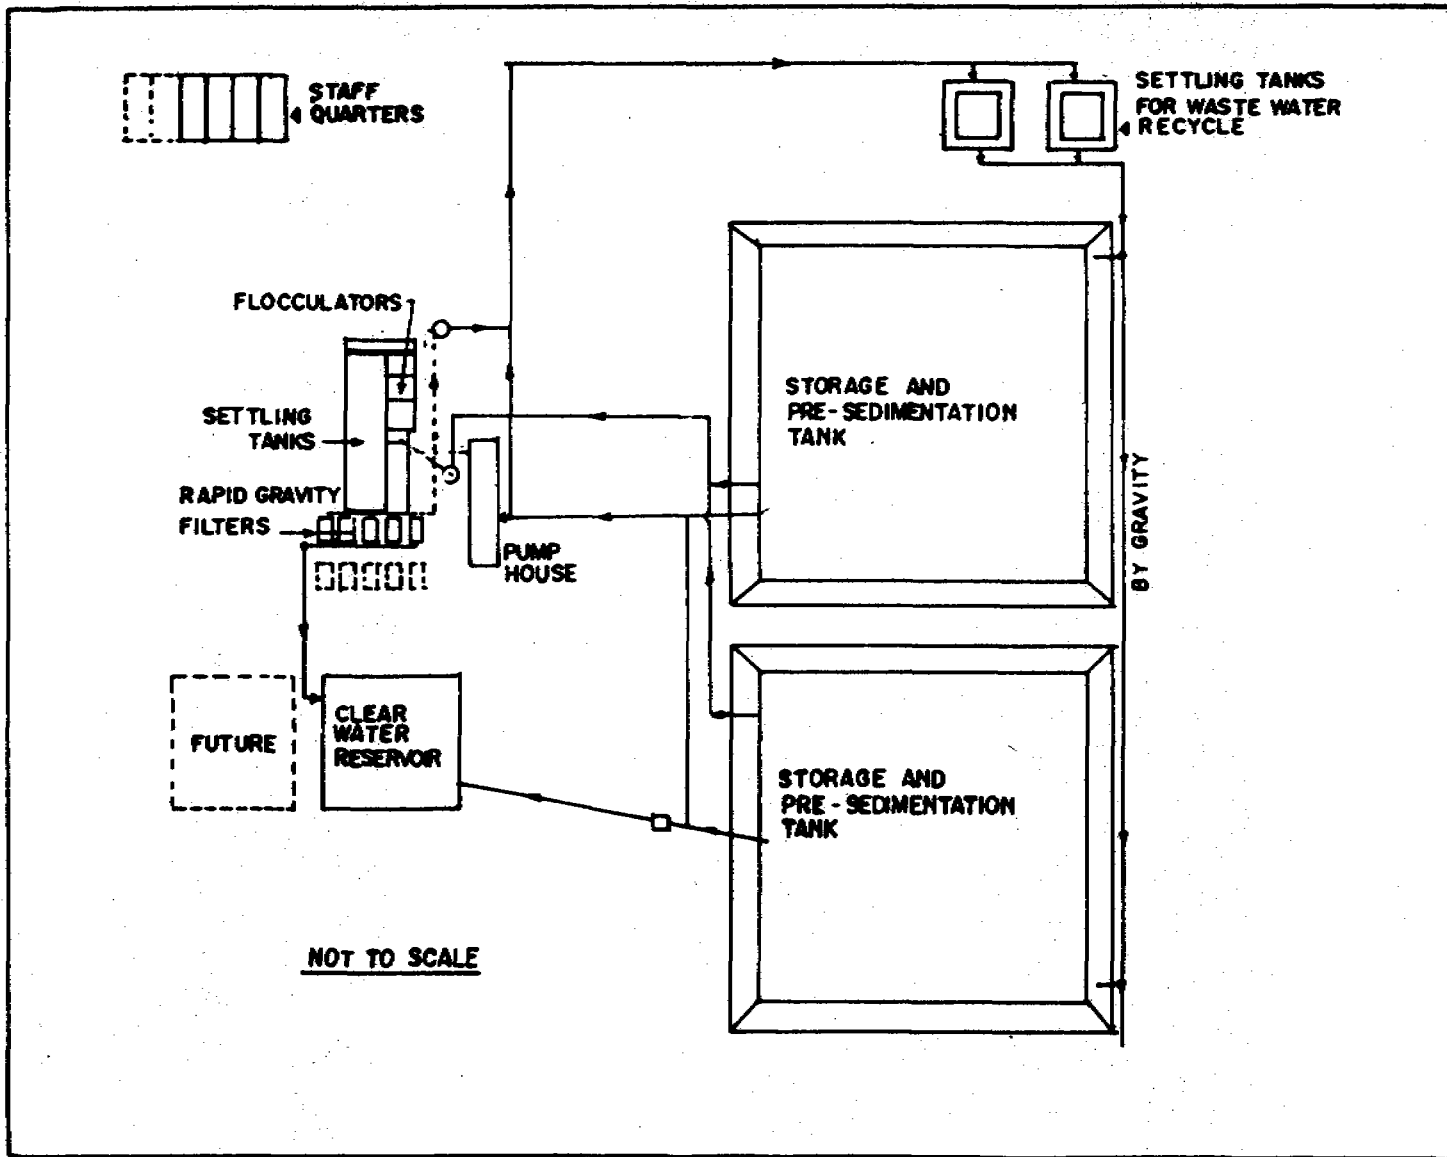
LAYOUT PLAN OF RAJPURA WATER TREATMENT PLANT
